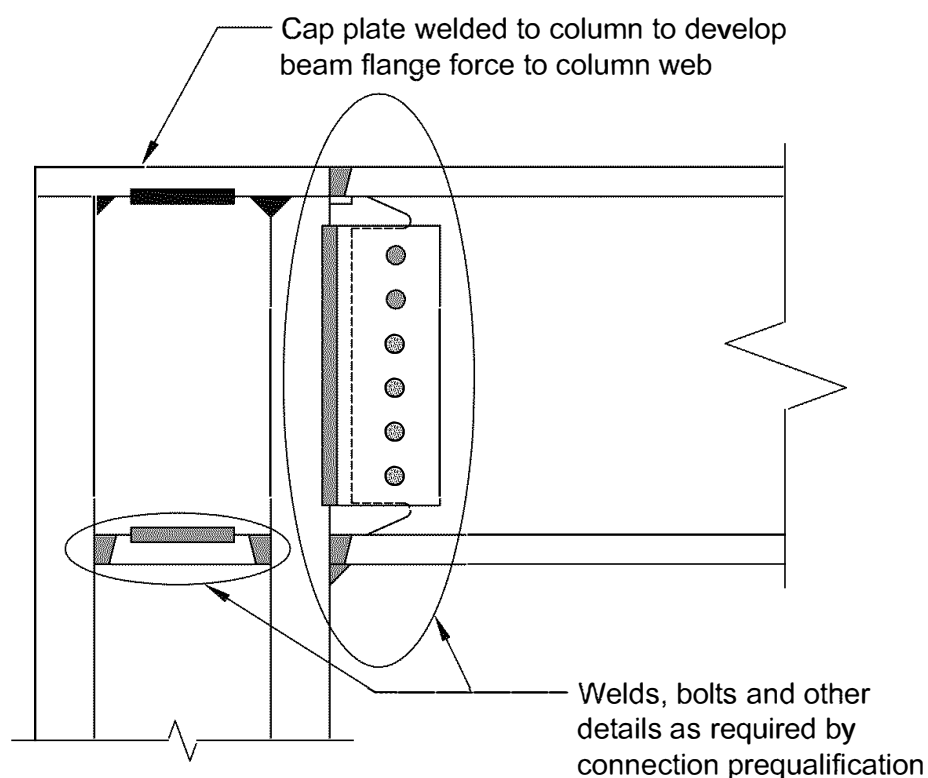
Example cap plate detail at column top for RBS connection.
